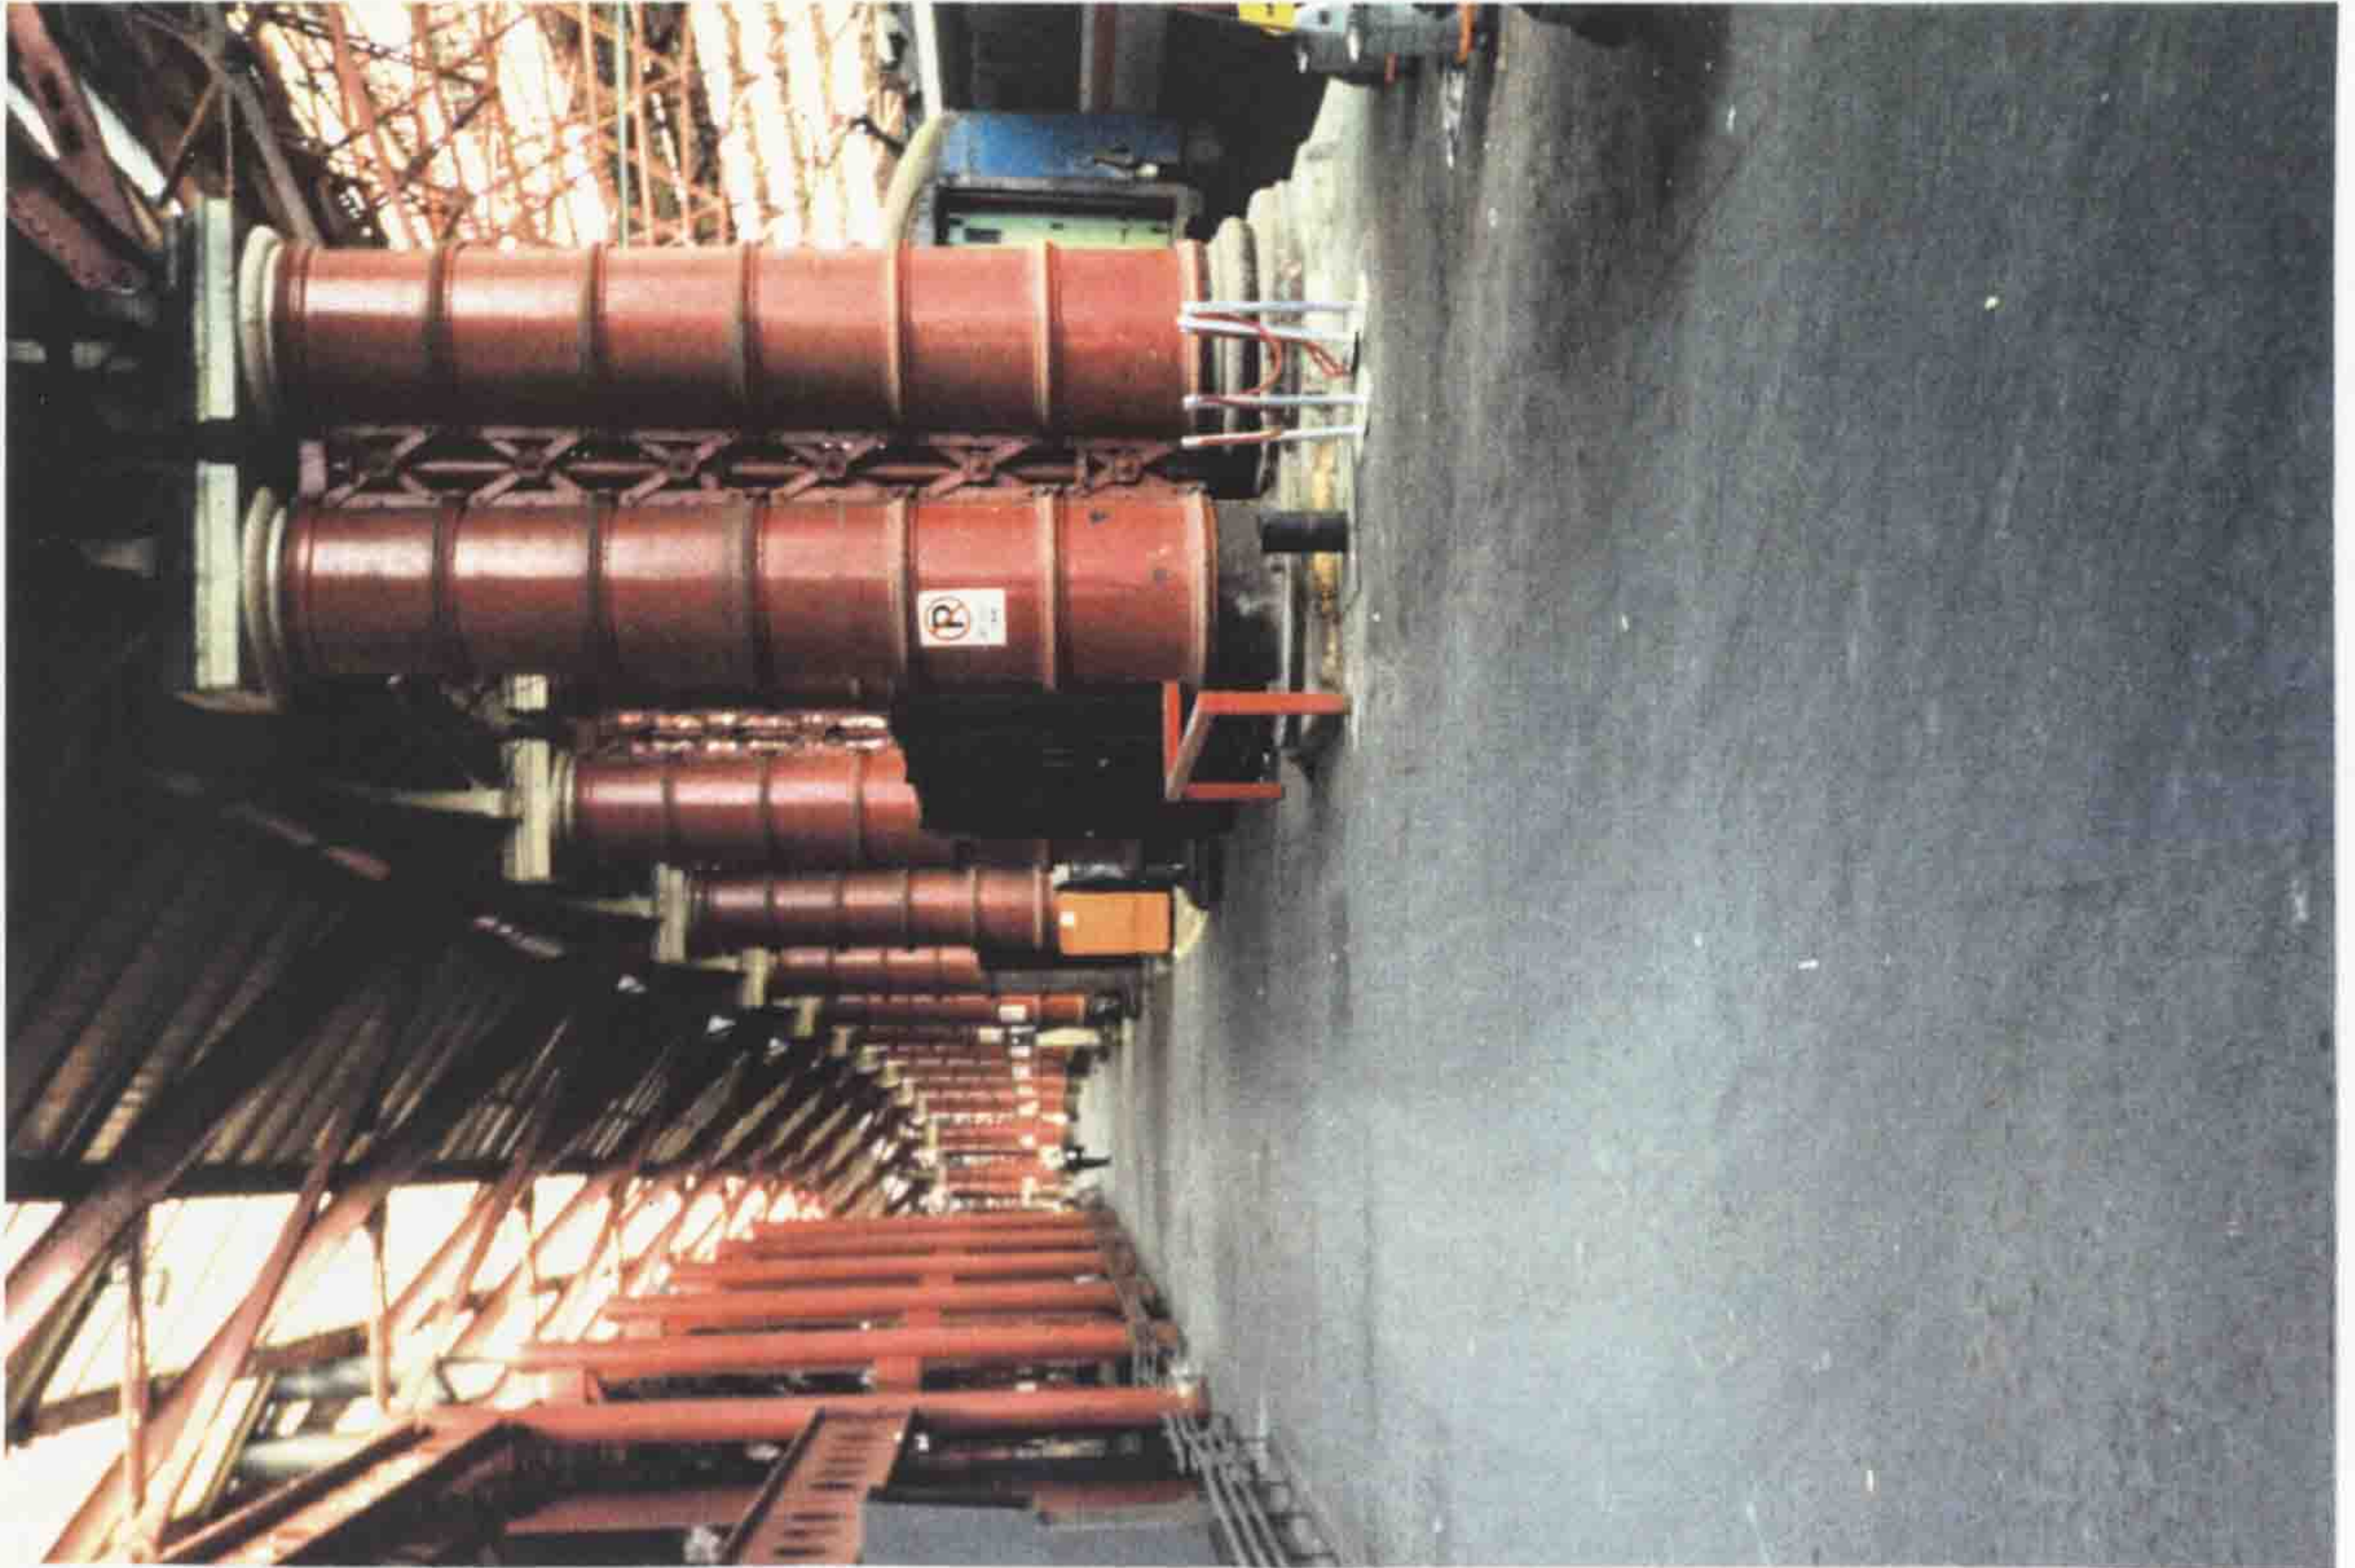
Photograph showing a column of supporting pillars in Lime Street Station.
